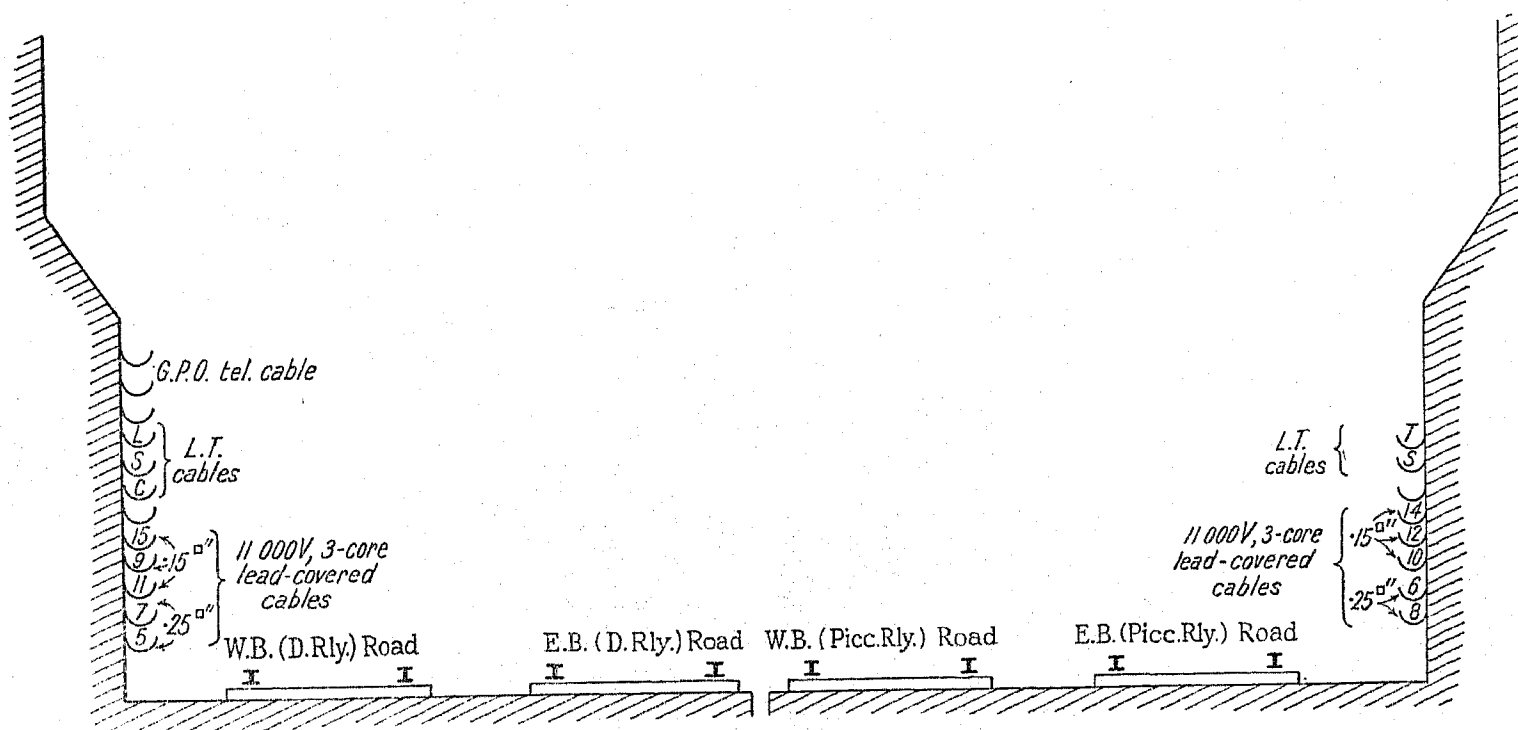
Section of cutting 100 yards west of Barons Court station, showing positions of cables on retaining walls.
